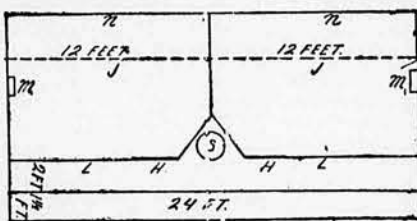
GROUND FLOOR OF POULTRY HOUSE.
